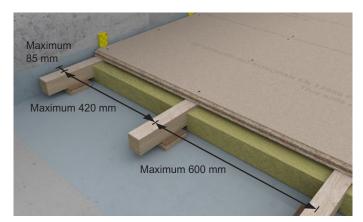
Subfloors are mounted with edge joists maximum 85 mm c-c along all walls. Joist and blocking spacing is shown in table 1.
